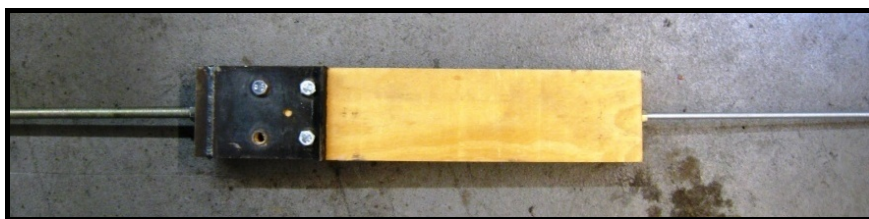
Timberlinx Furnace Test Specimen
